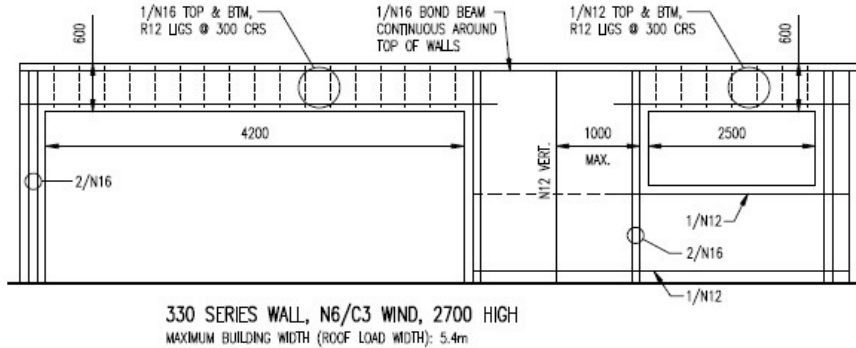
2700 High Wall, N6/C3 Wind Rating, 330 Series ECO-Block (Max. roof load width: 5.4m)
